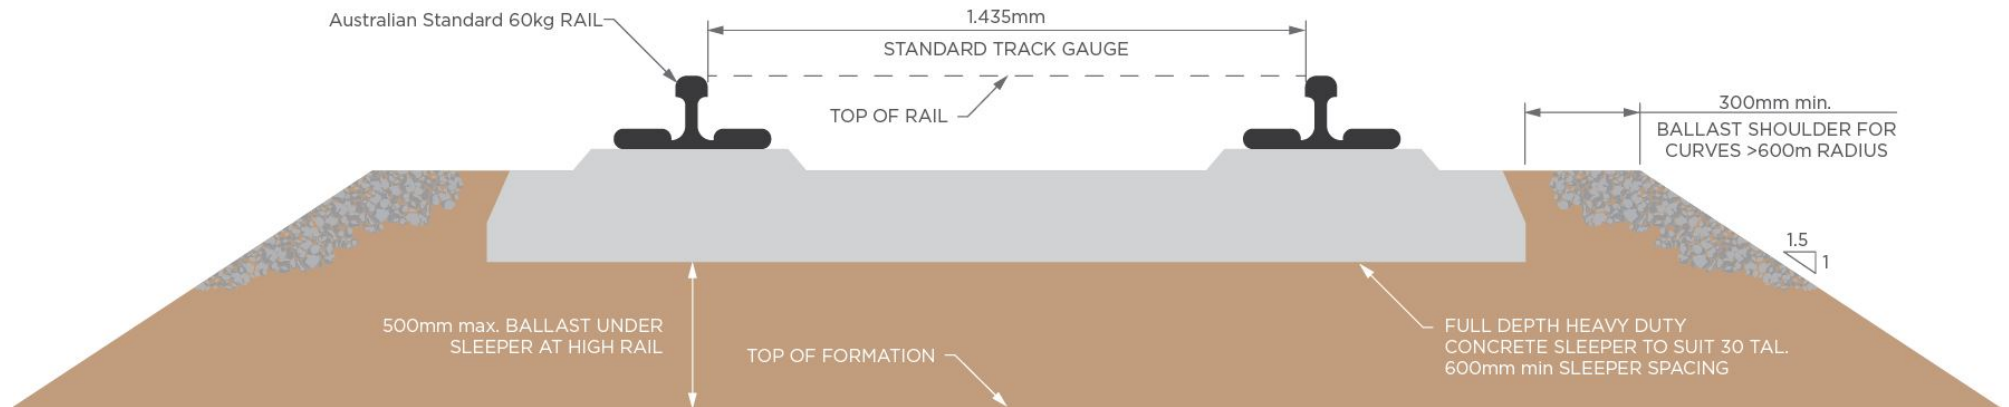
TYPICAL STANDARD-GAUGE BALLASTED TRACK CROSS SECTION
